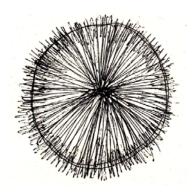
Roof plan of a Granary (*Dhaner Gola*) (Source: Author 2013)
